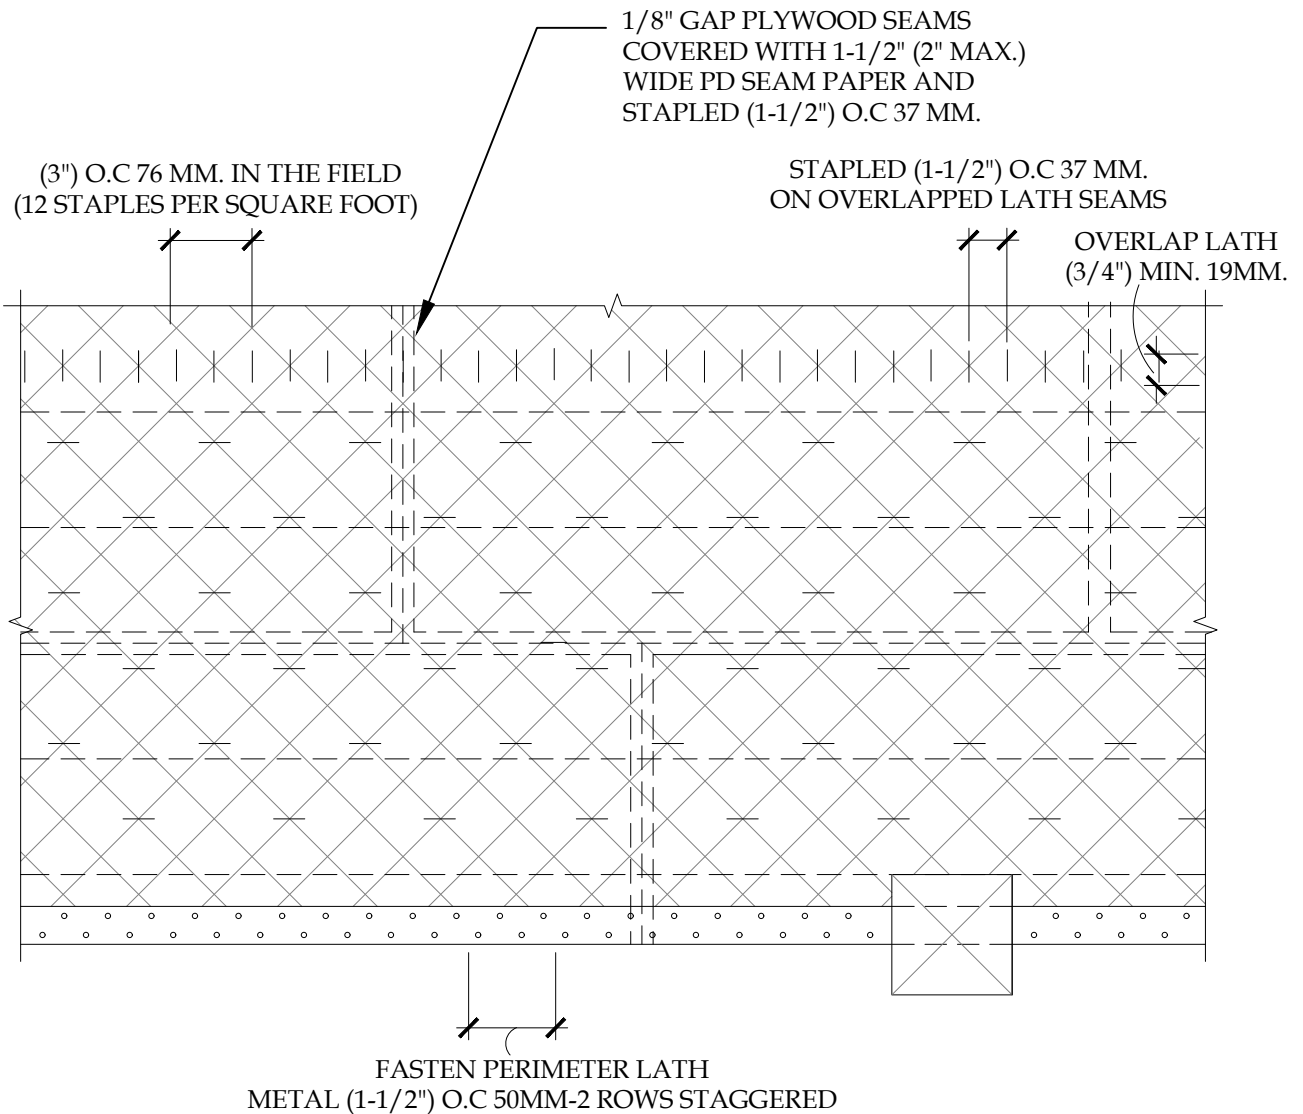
DETAIL-PLI-DEK SYSTEM - DECK PLAN VIEW - INCLEMENT WEATHER
